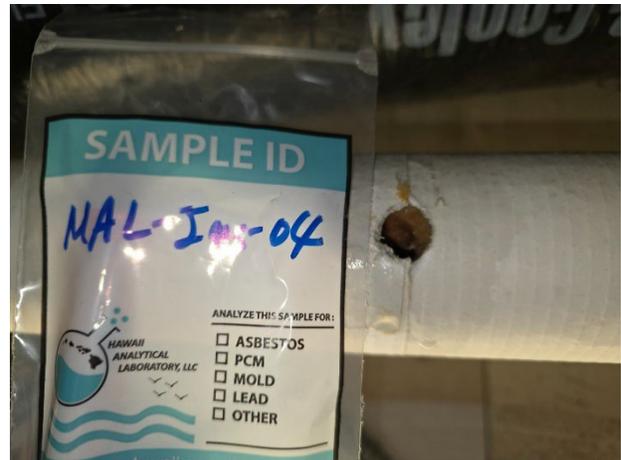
Sample ID: MAL-Ins-04 White wrap and dark yellow insulation, Above Drop Ceiling, Recreation Room.
